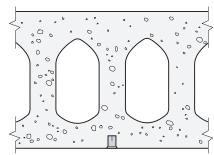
Hollow-Core Concrete Panel (anchor can be installed below web or hollow core)
